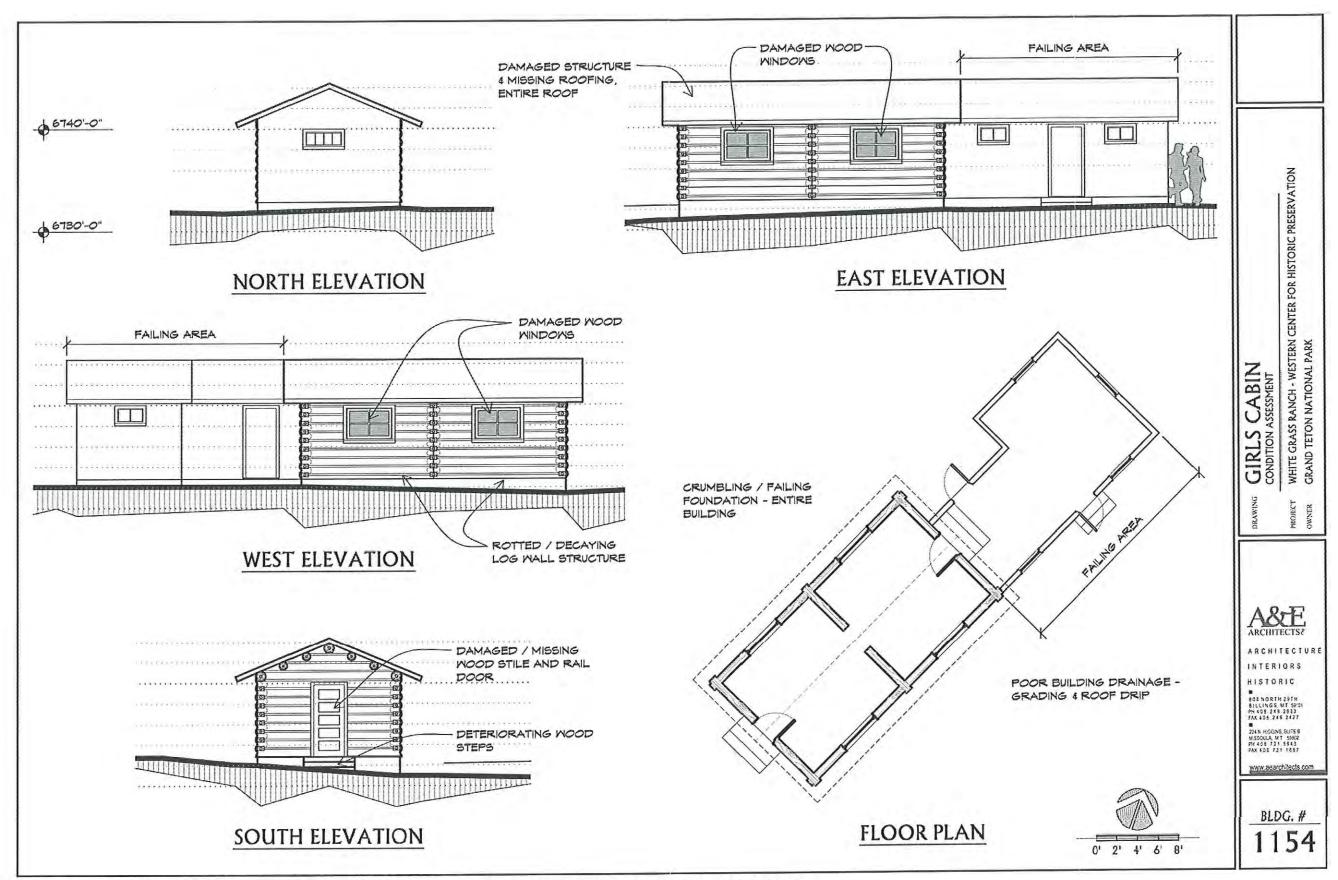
Existing conditions plan and elevations of HS-1154, Girls' Cabin, showing areas of deterioration (A&E: 2006).
